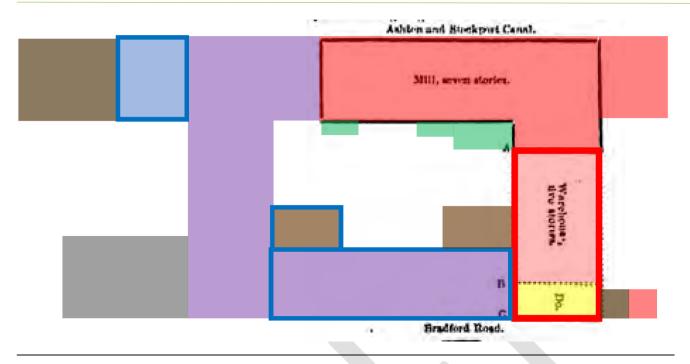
Morphological plan of Brunswick Mill, showing the original mill constructed in 1839 shaded red and pink. The area shaded yellow was constructed in 1840-1. The area shaded pink collapsed in 1841, and along with the yellow section (together circled red) was totally reconstructed that same year.
